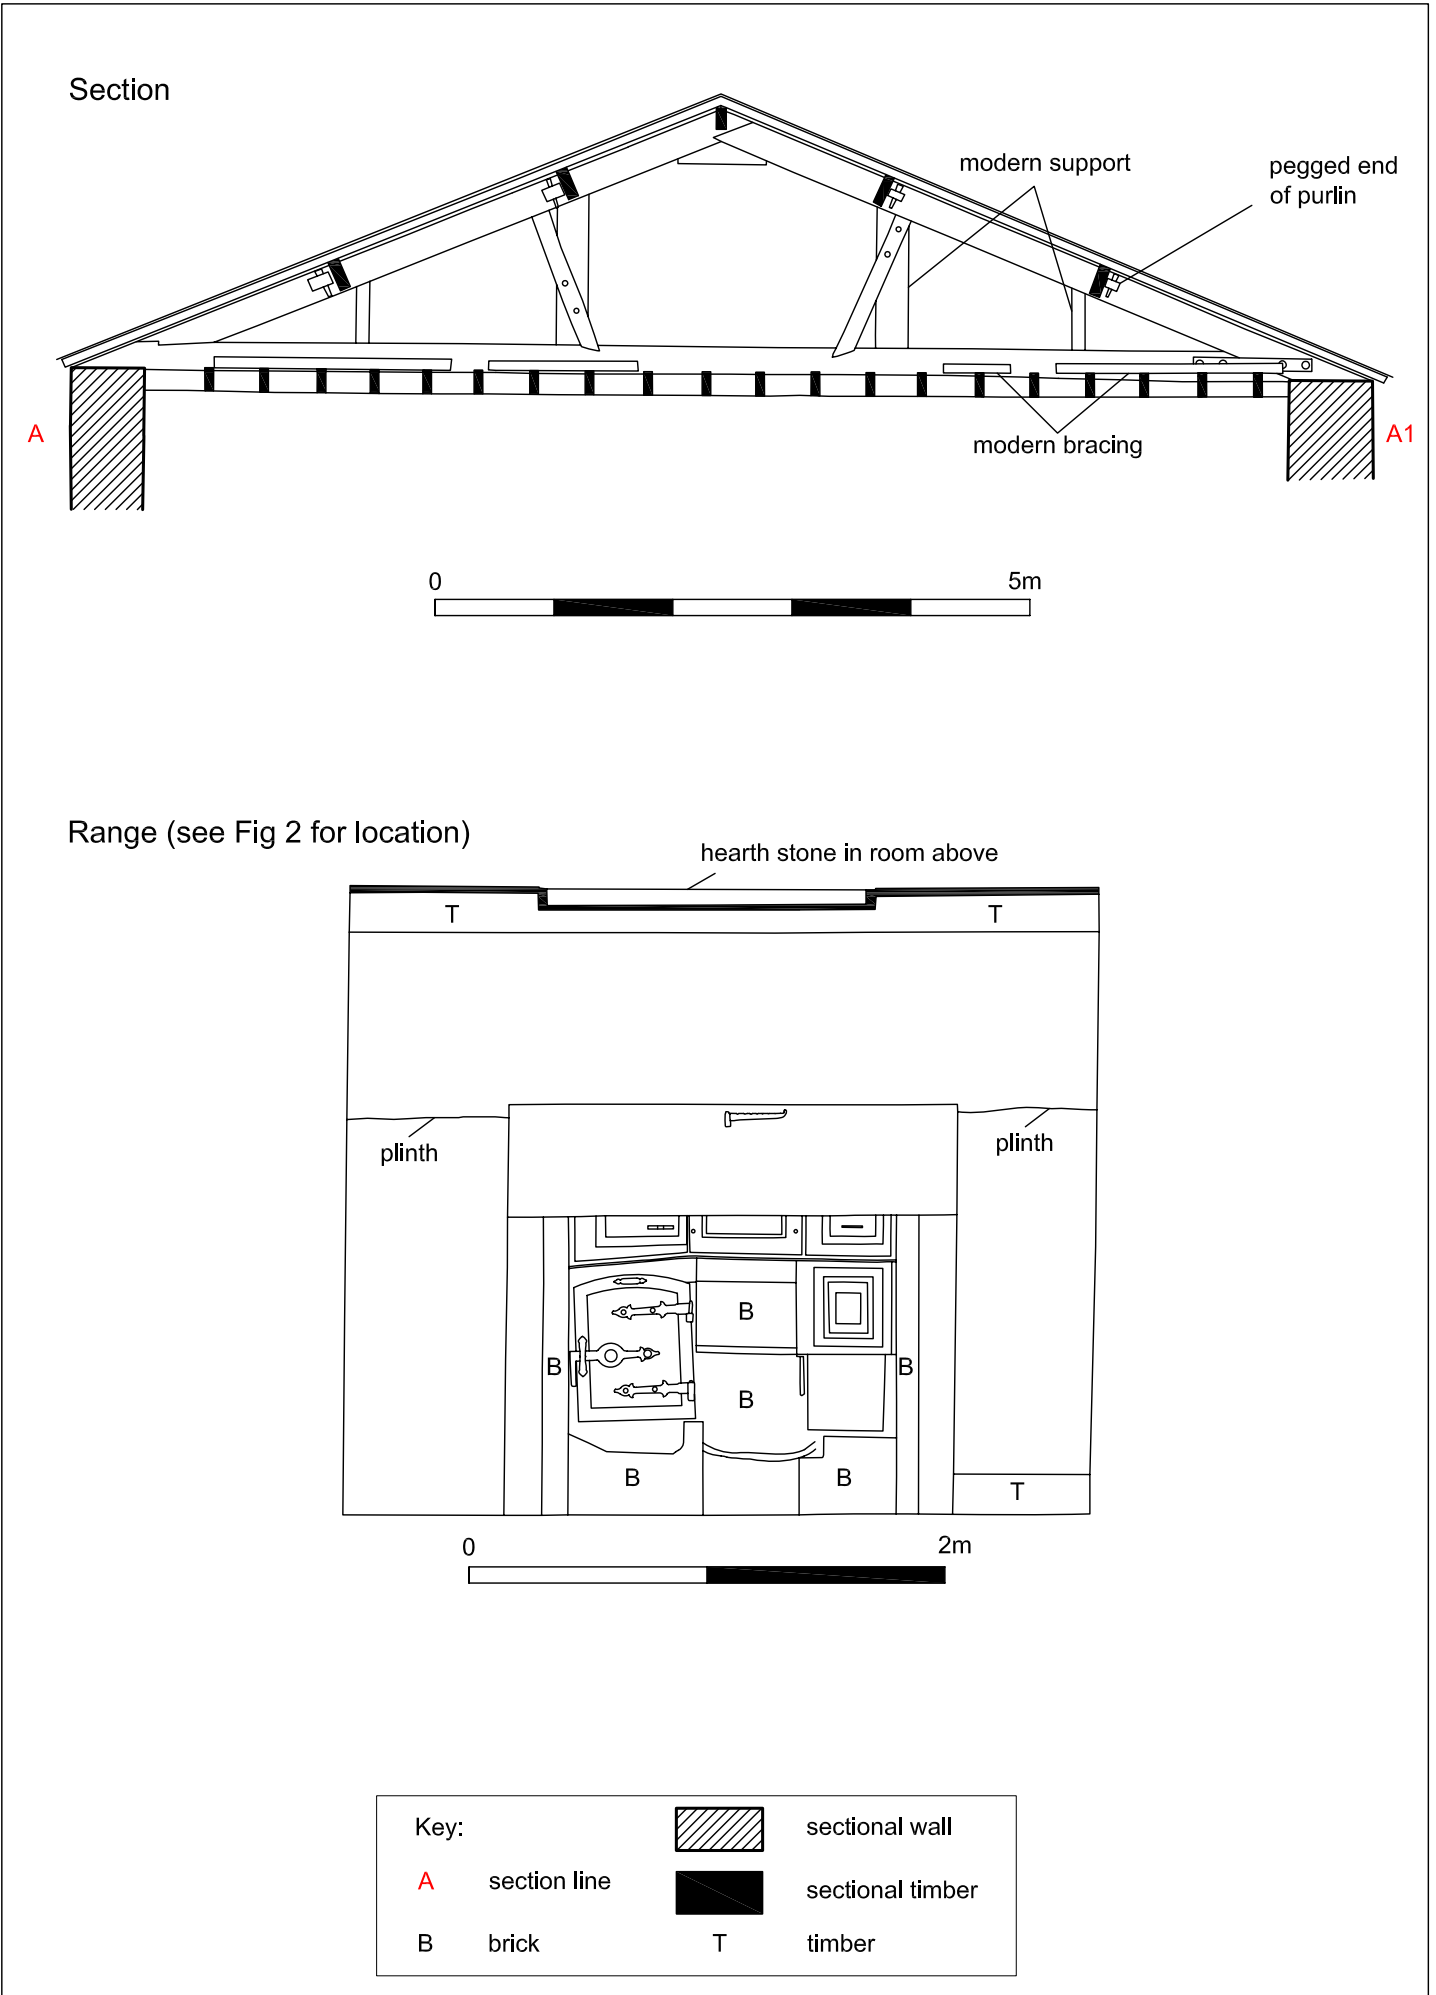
North-facing section through roof space and south elevation of basement Room 3 showing range
